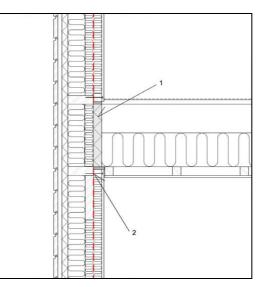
Example of continuous air barrier in a timber-framed external wall at the junction of an intermediate floor.
